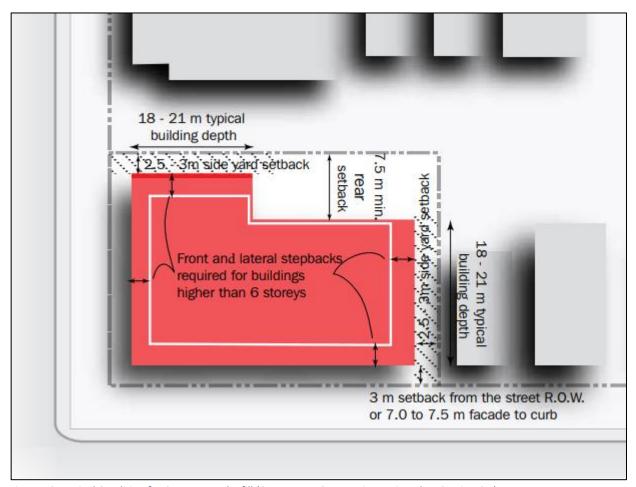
Typical Condition for Corner Parcel Infill (Centretown Community Design Plan, Section 6.4)
